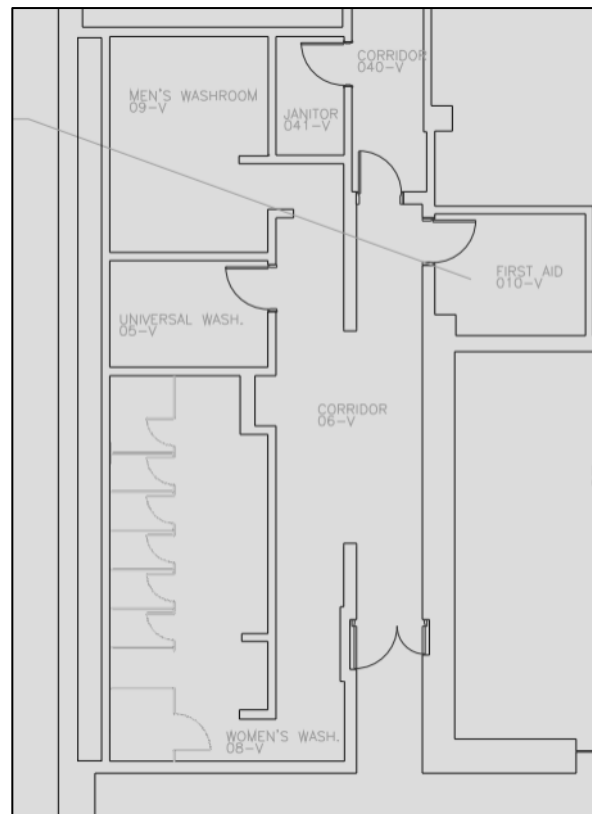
Partial floor plate floor 0 VWC showing corridor 06-V and washrooms (NorrDialog, 2021)
